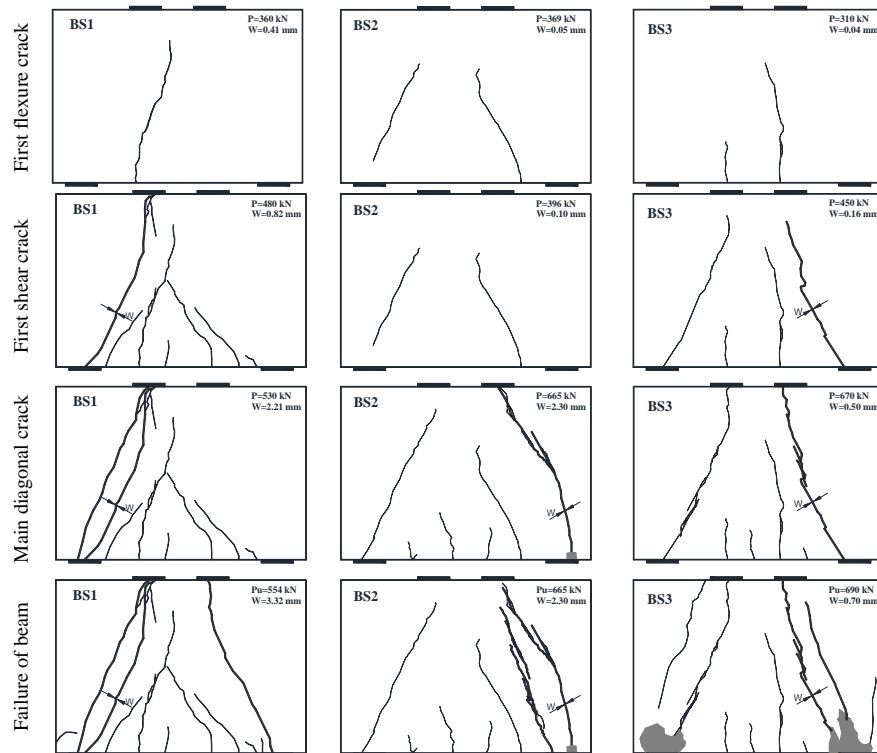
Crack development and mode of failure for the deep beam with steel web reinforcement
